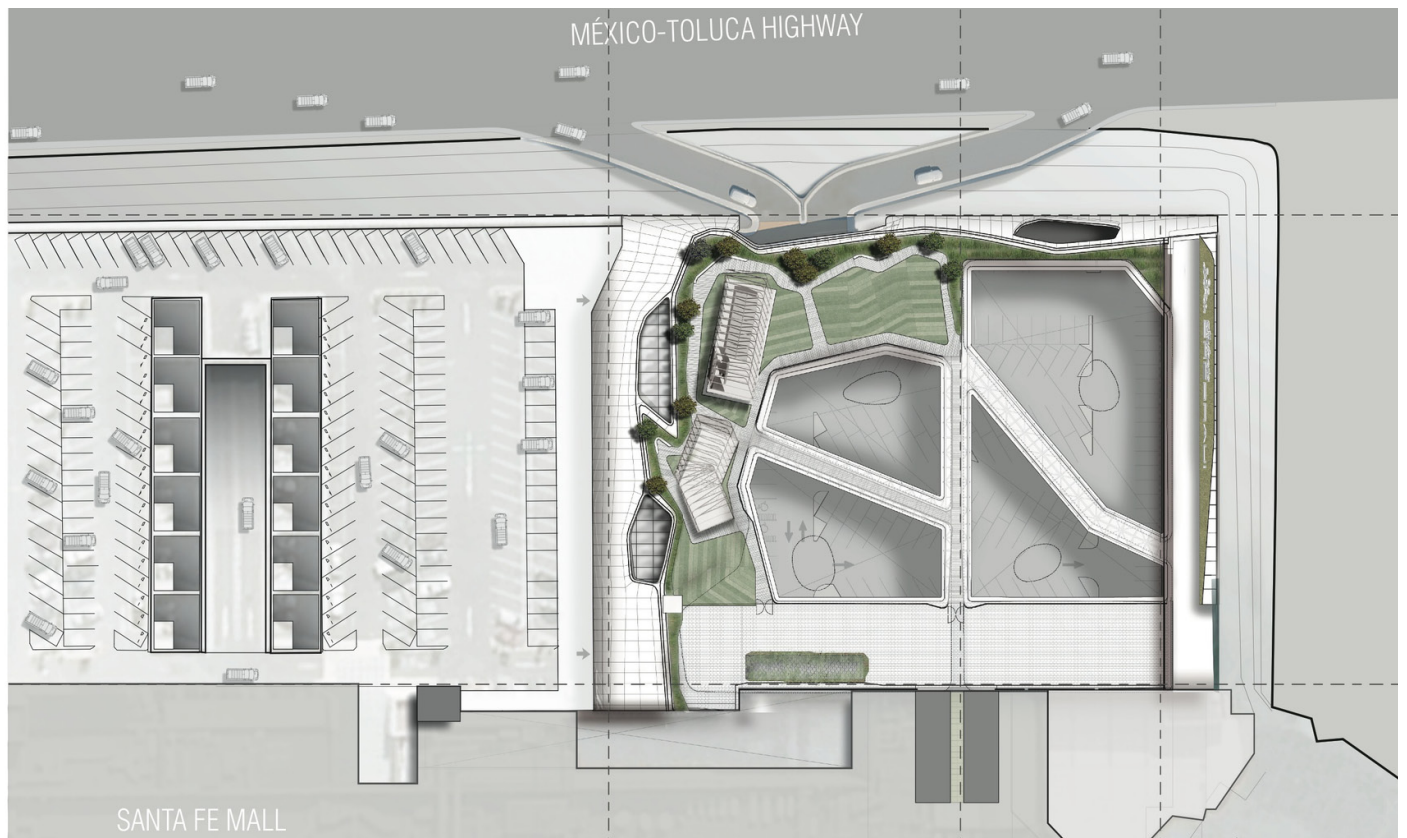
, Chedraui Supermarket Store in Santa Fe, Mexico City ,plan showing rooftop parking and orchard
